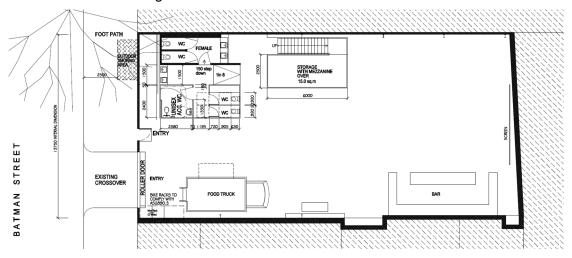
Proposed internal warehouse arrangement (Source: Applicant)
